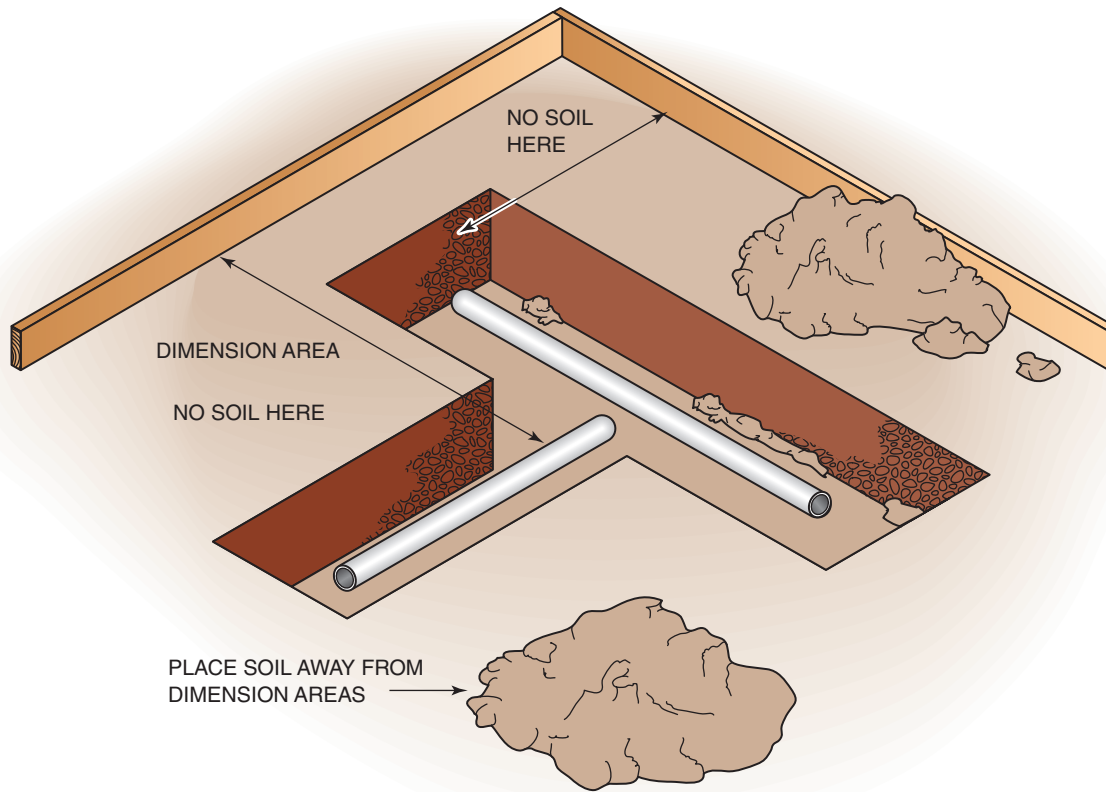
Location of excavated soil should not conflict with dimension areas to install a pipe in a trench.
